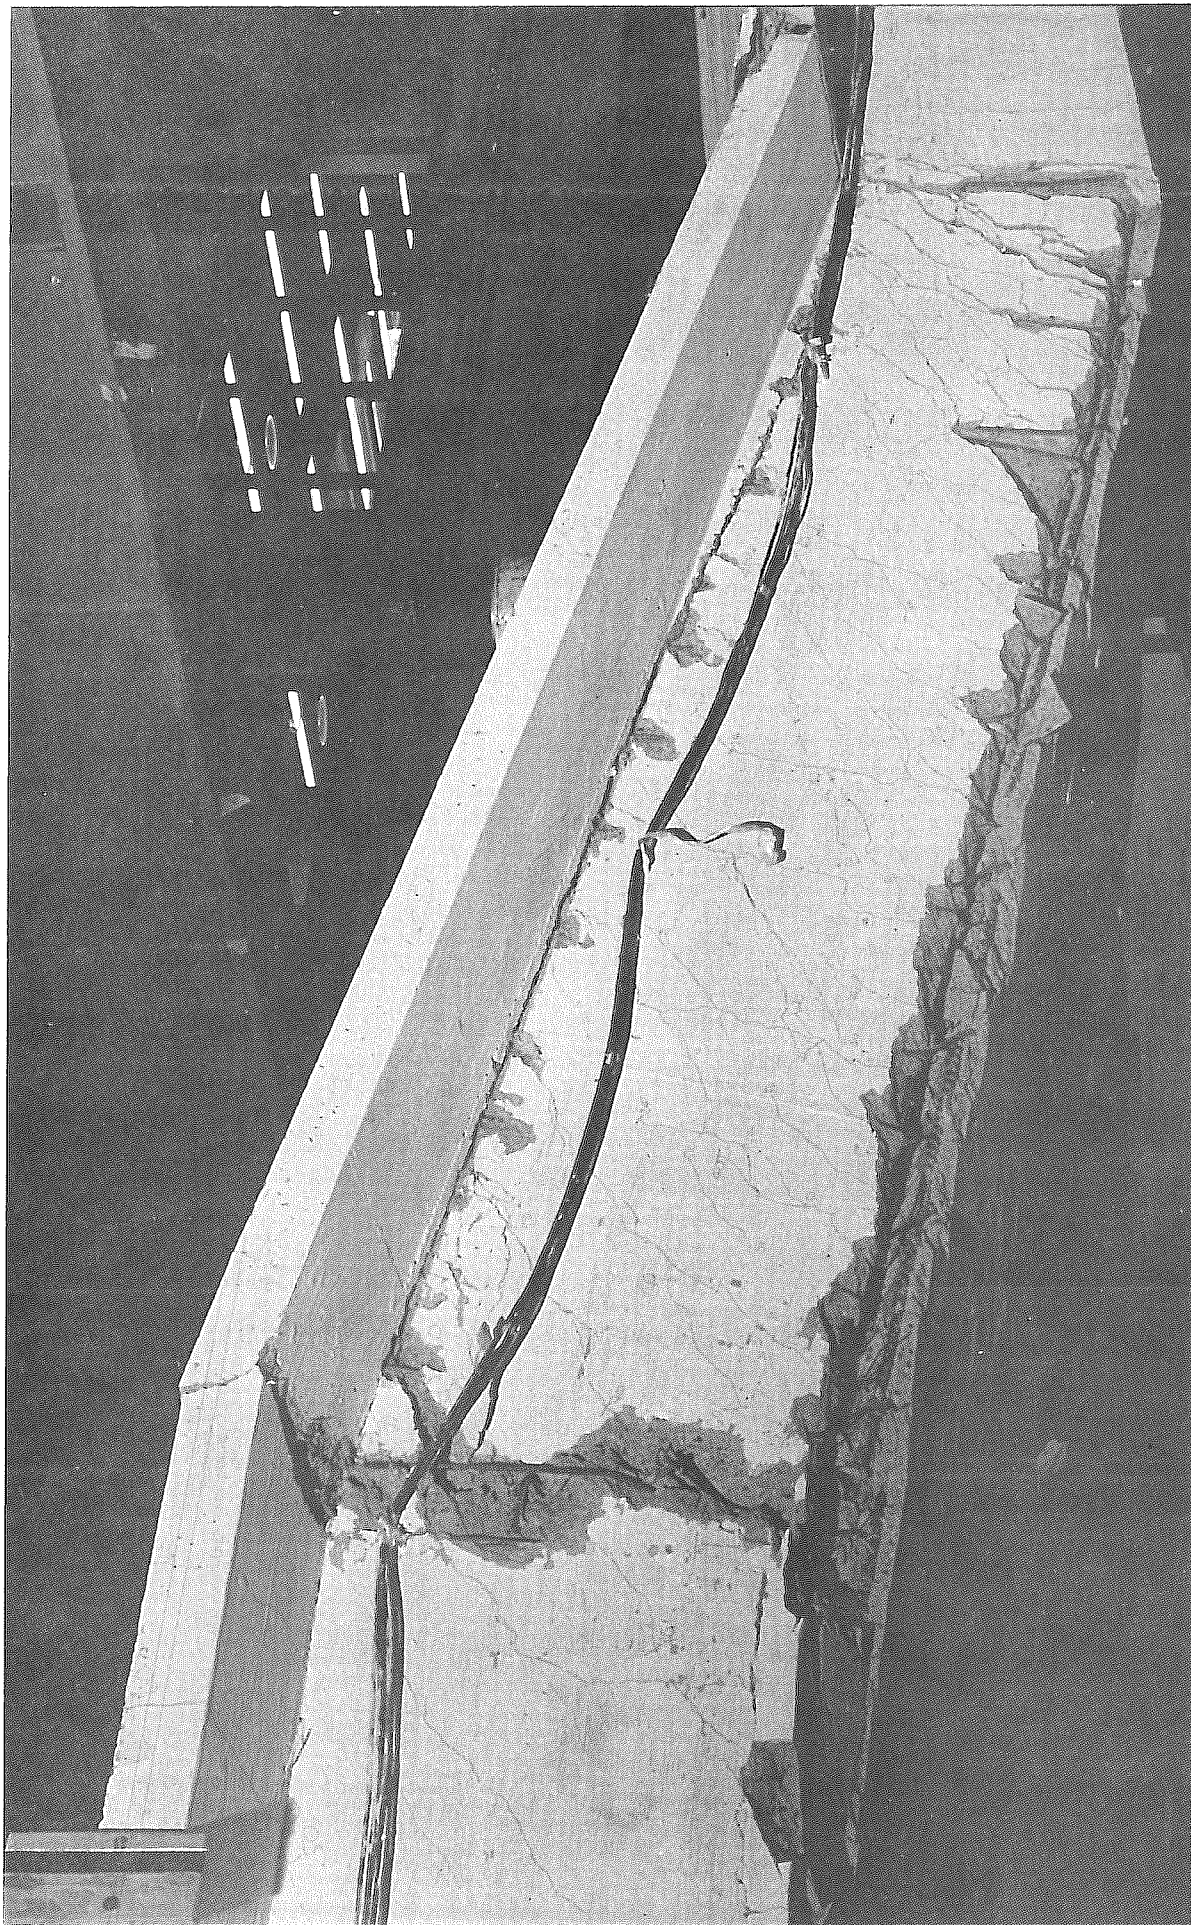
FINAL DEFLECTED SHAPE AND CRACK PATTERN FOR GIRDER 5
